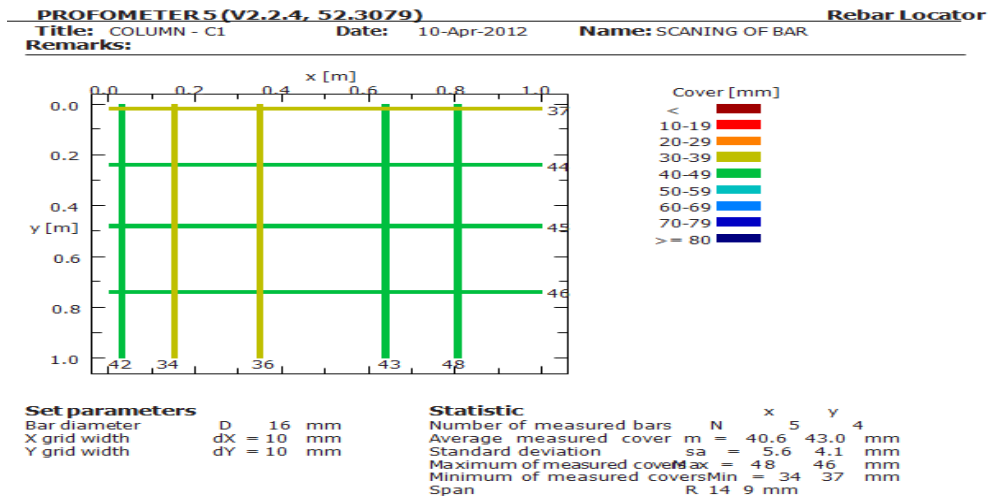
Results of Rebar Locator for Column C1, Building Rcc at Bhopal Karond
